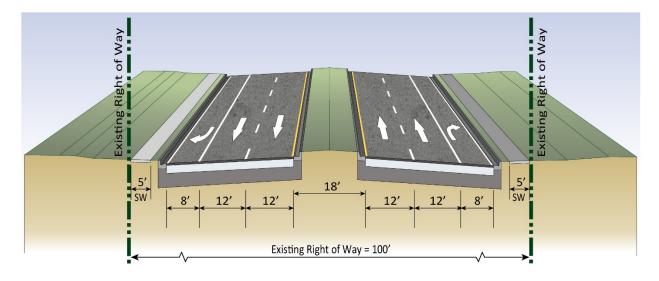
SR 29 Existing Typical Section from North 1St Street to North 9th Street
